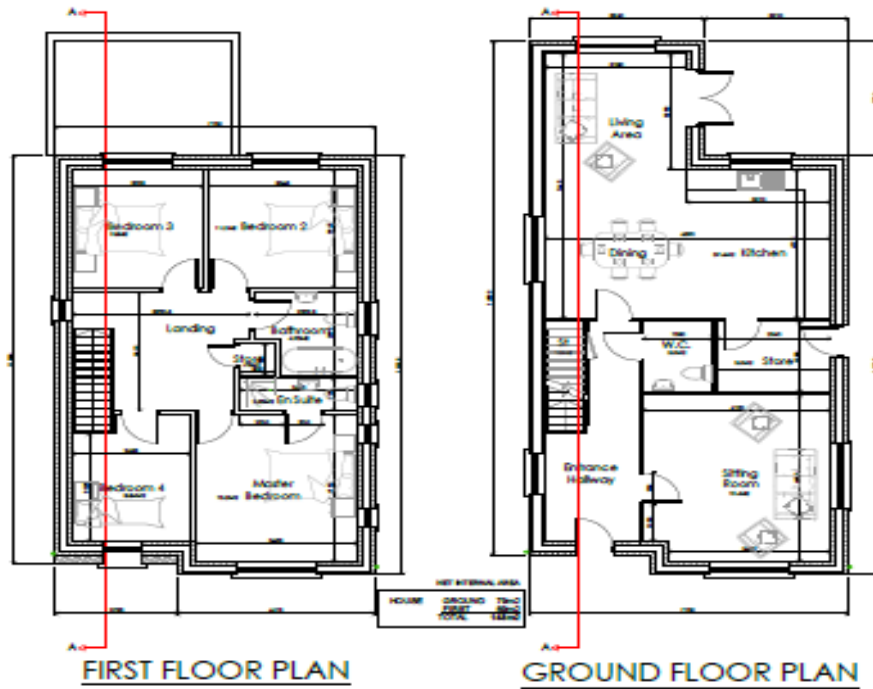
House Type A, A1, A2 – 4-Bed Semi Detached Elevations vary in types
